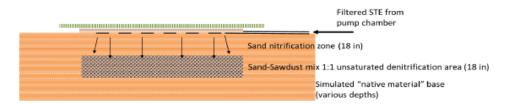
Unsaturated system design constructed in sand provided by Stony Brook University and originating from Long Island, New York. STE = Septic tank effluent. DESIGN 5
